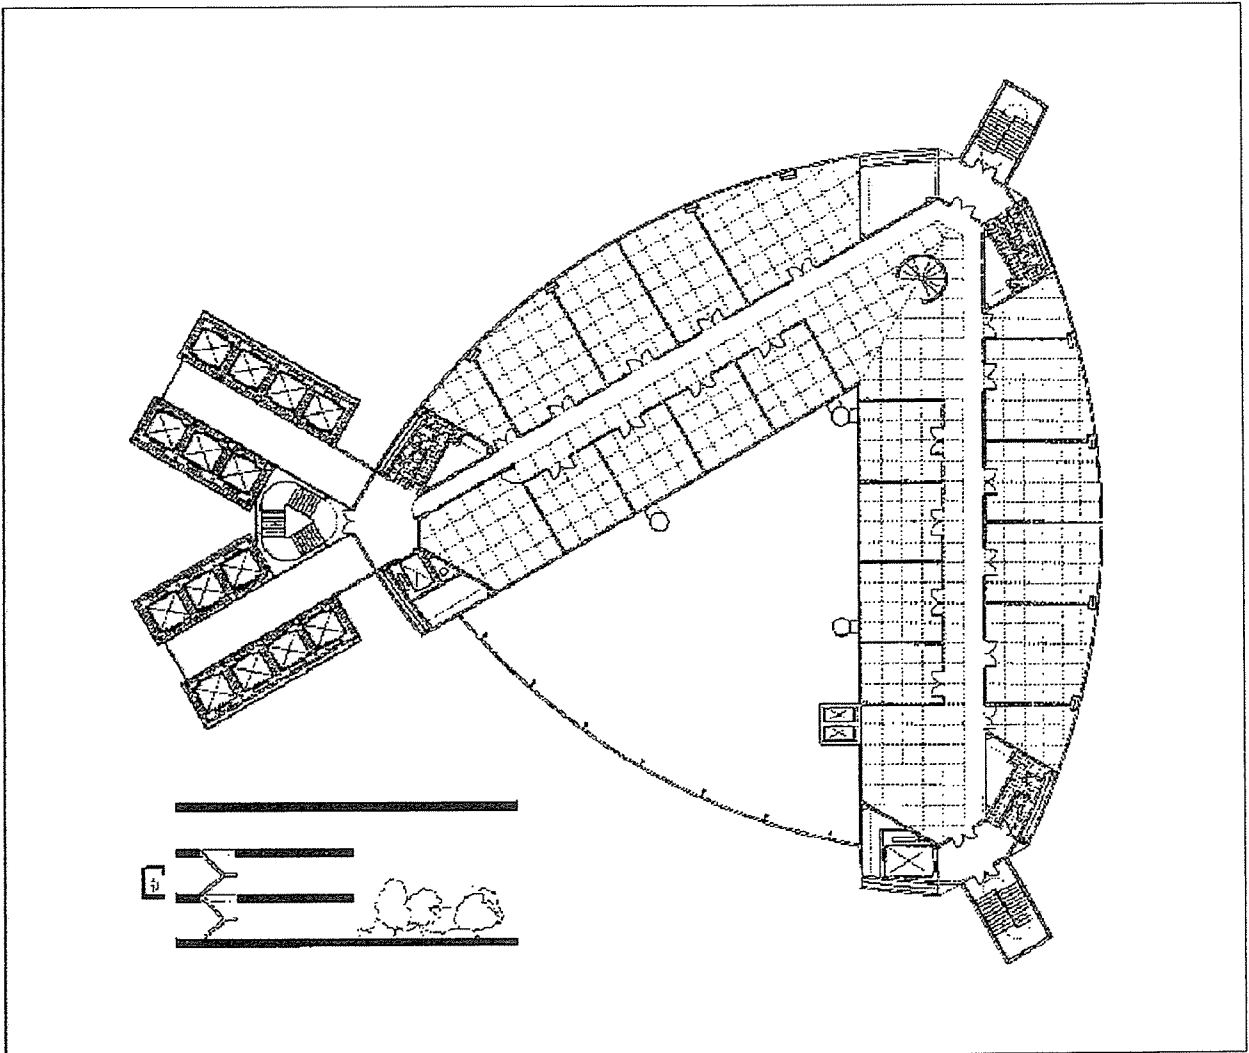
November 1991 Competition Draft; Typical Floor with Elevator Core beside the Garden
